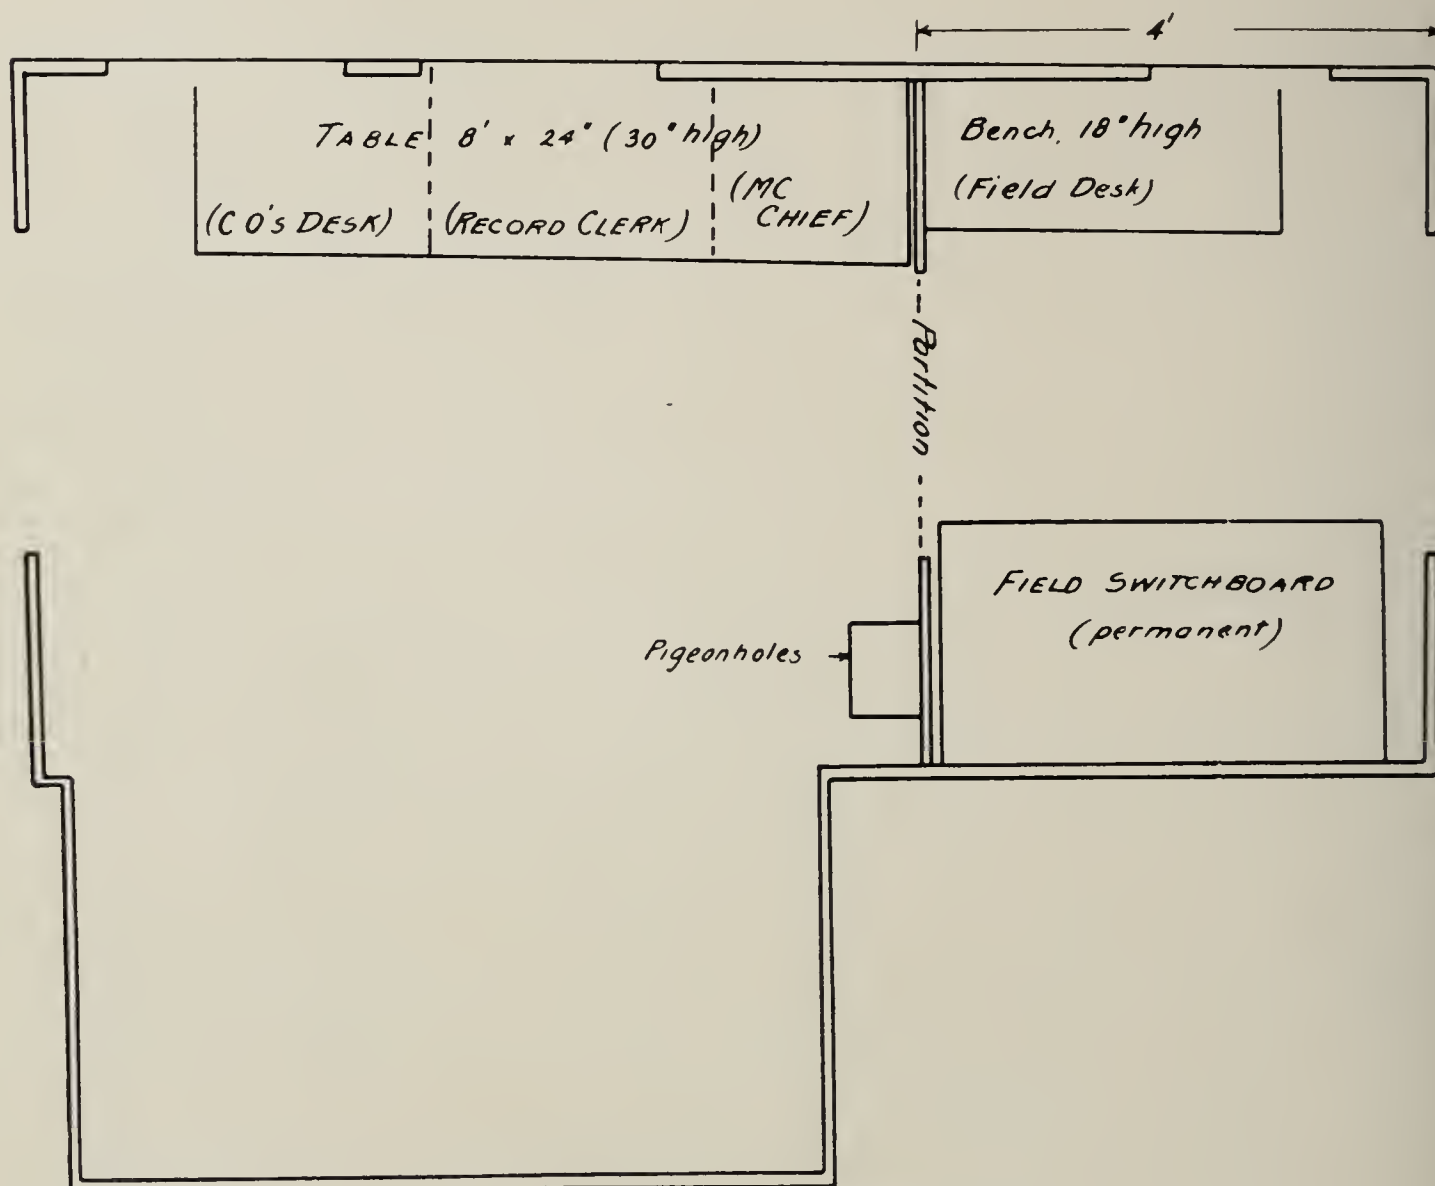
FLOOR PLAN AND ARRANGEMENT (Interior)
